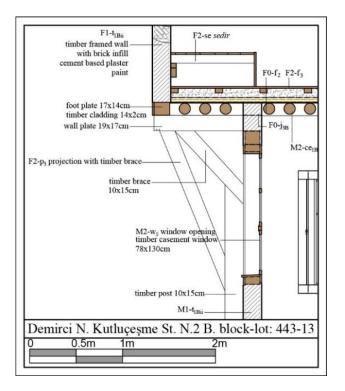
Section drawing of projection supported timber brace, Type3 (Demirci N. b. block-lot: 443-13)
